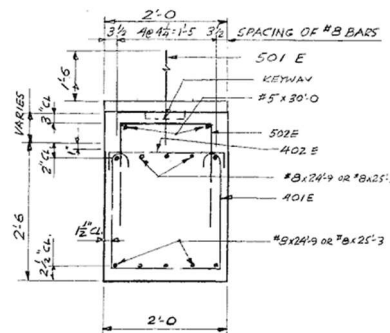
Typical Cross-section of Beam for Bridge (NBI 14650) (1964)
